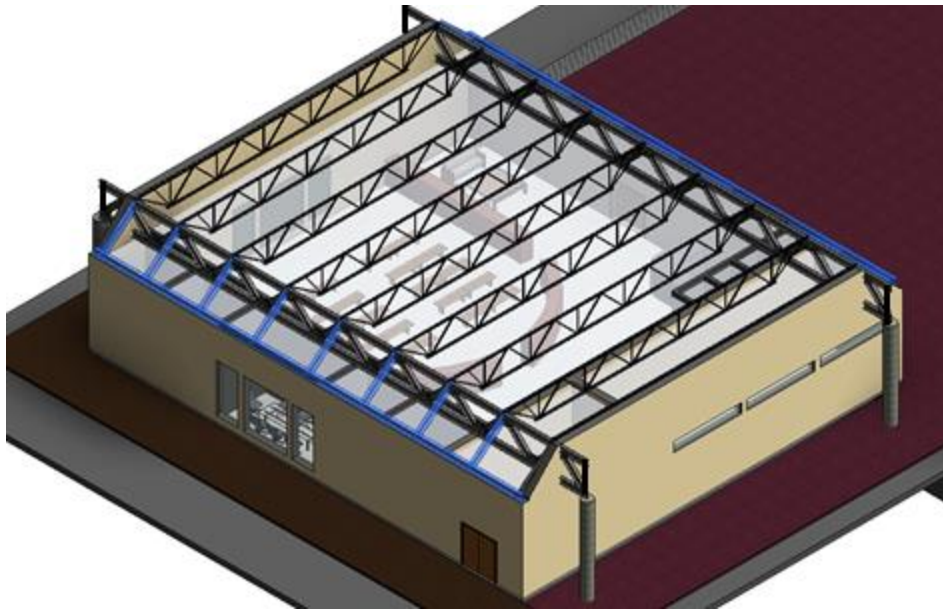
A 3D model of the MCC, highlighting the beams and girder used to support the angled roof ends.
